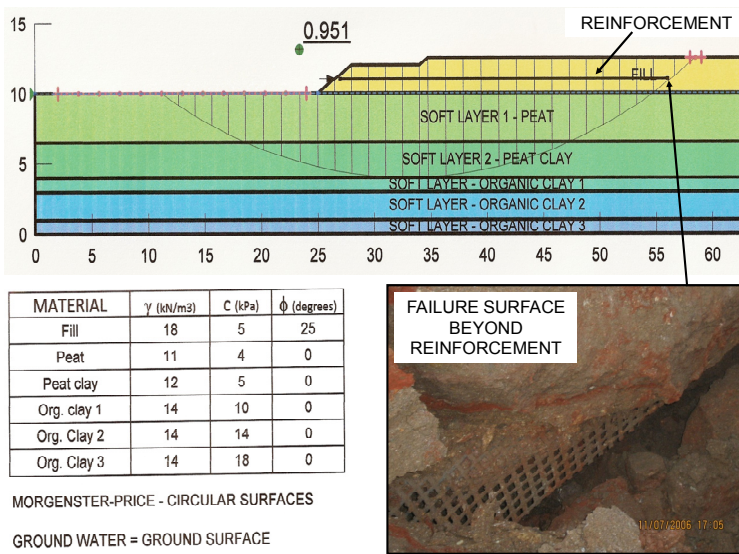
Typical section of failed fill with insufficiently long reinforcement
